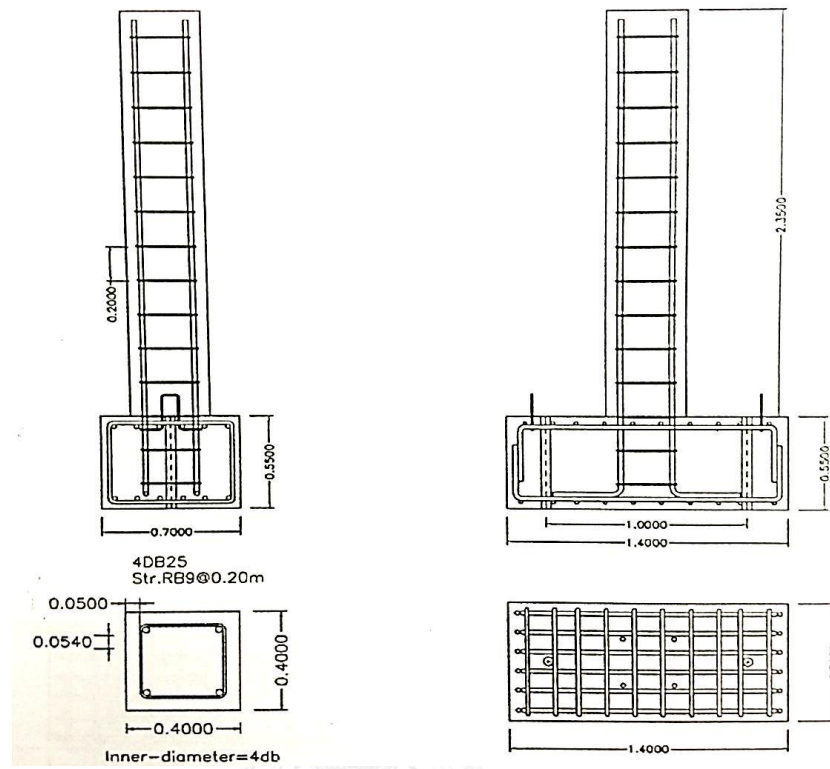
Reinforcement detail of tested RC column (Vorakorn, 2008)
